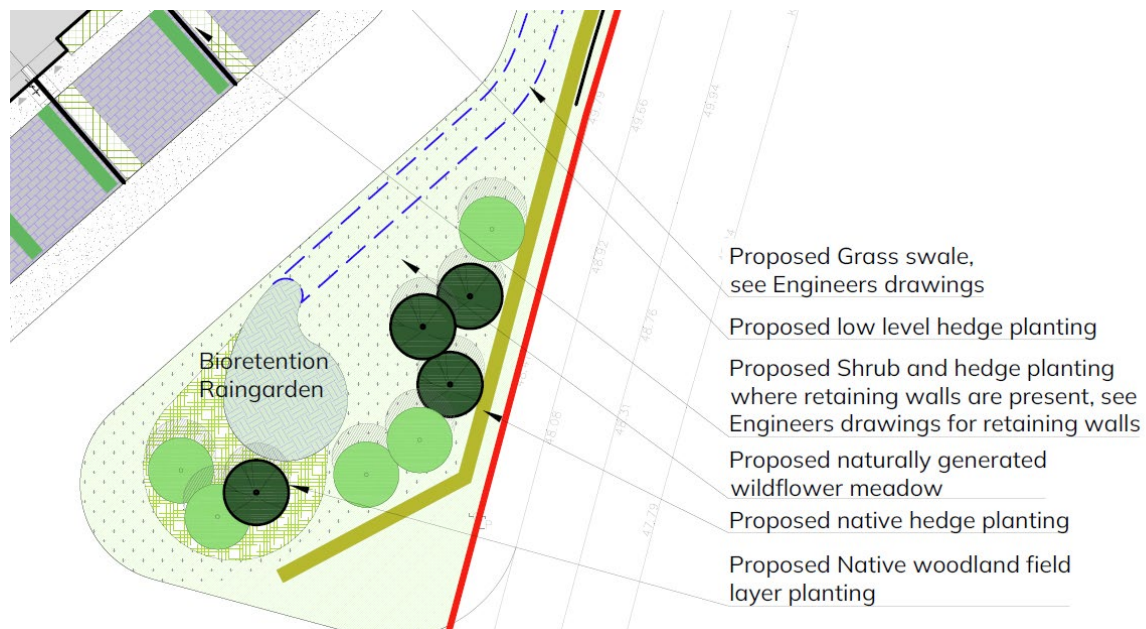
Native hedgerow connecting to Woodland field layer with semi-mature trees and a bioretention rain garden connected to a roadside swale
